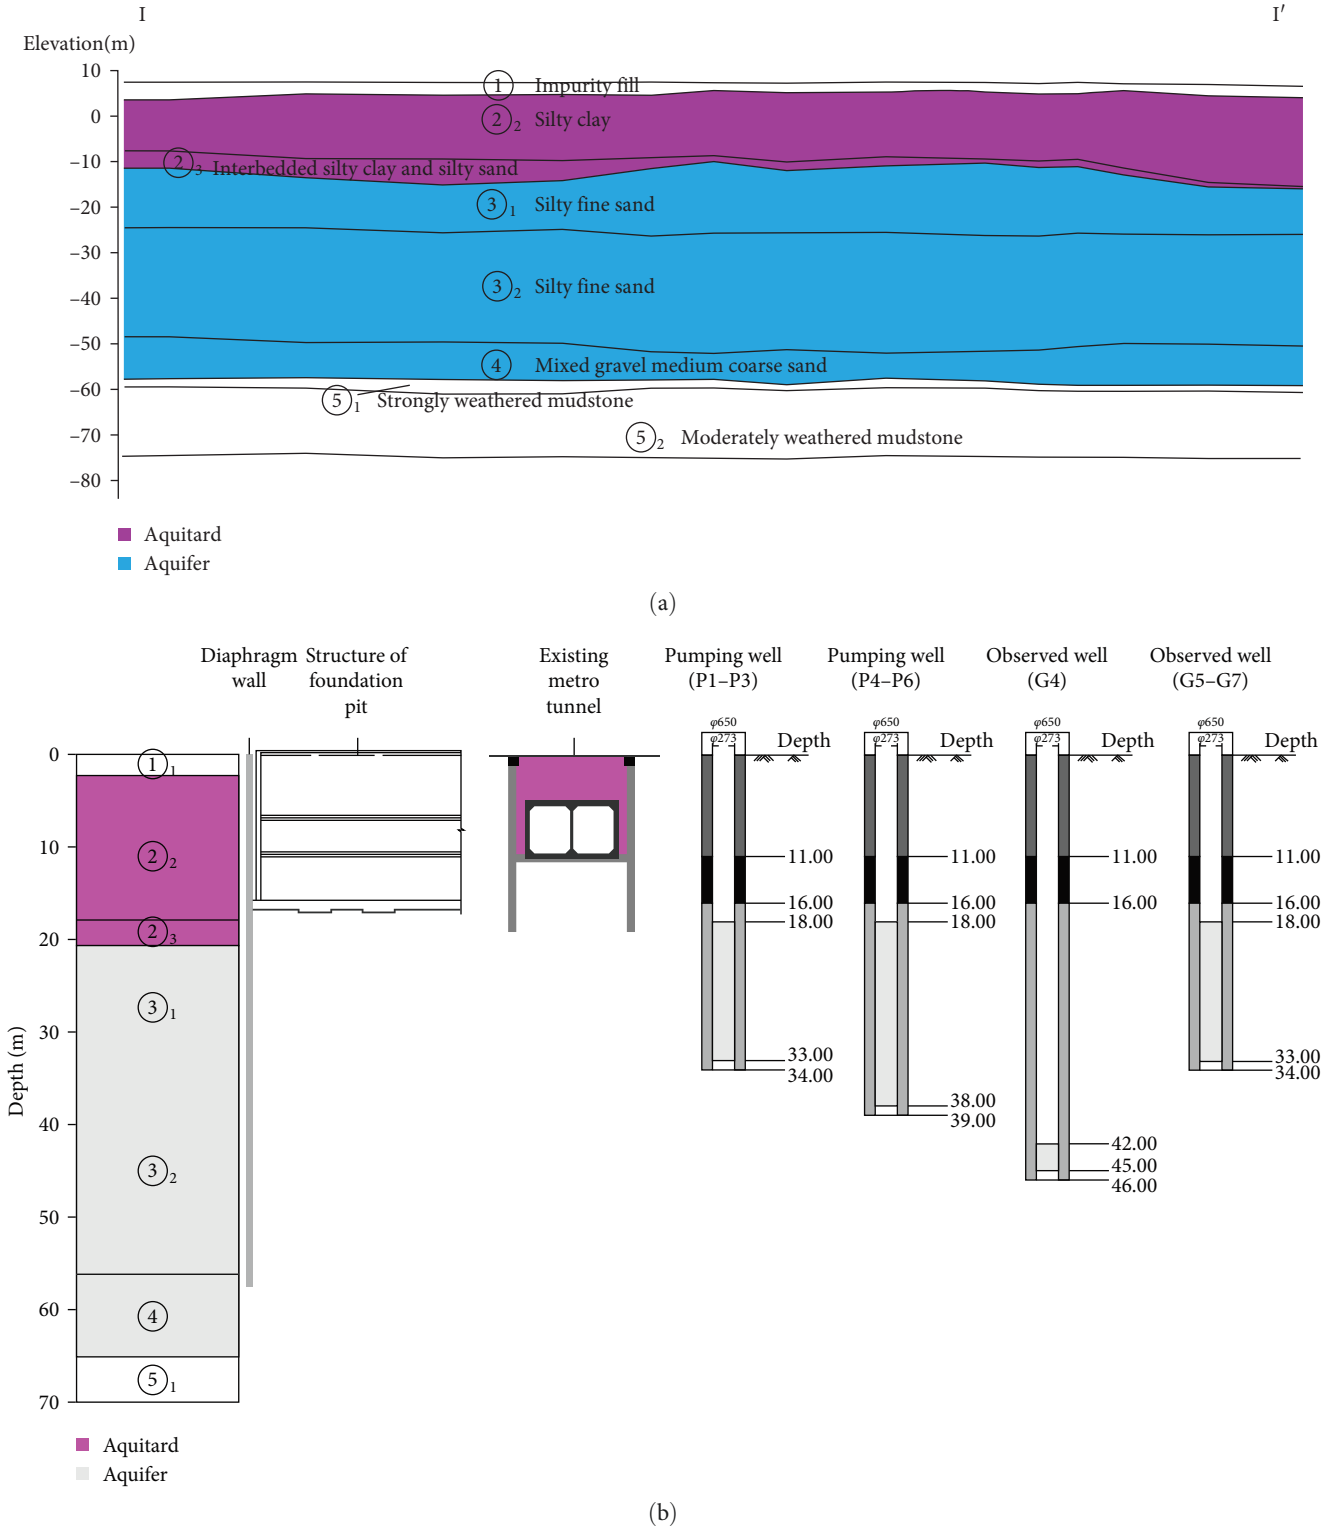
The typical profile of the soil, the structure of the foundation pit, the tunnel, and the pumping/recharge well. (a) The typical profile of the soil (I-I'). (b) The typical cross-sectional profile of the structure of the foundation pit, the tunnel, and the pumping/observed wells.
